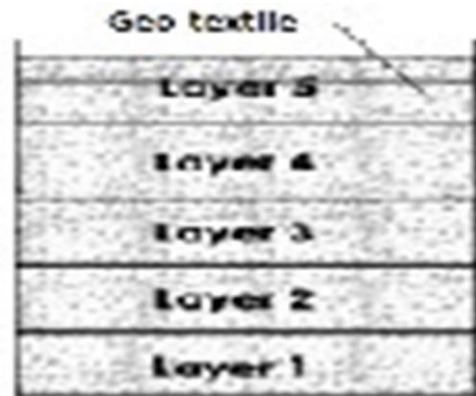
Schematic representation of test specimen with reinforcement by Geo textile at top 1/5th layer.
